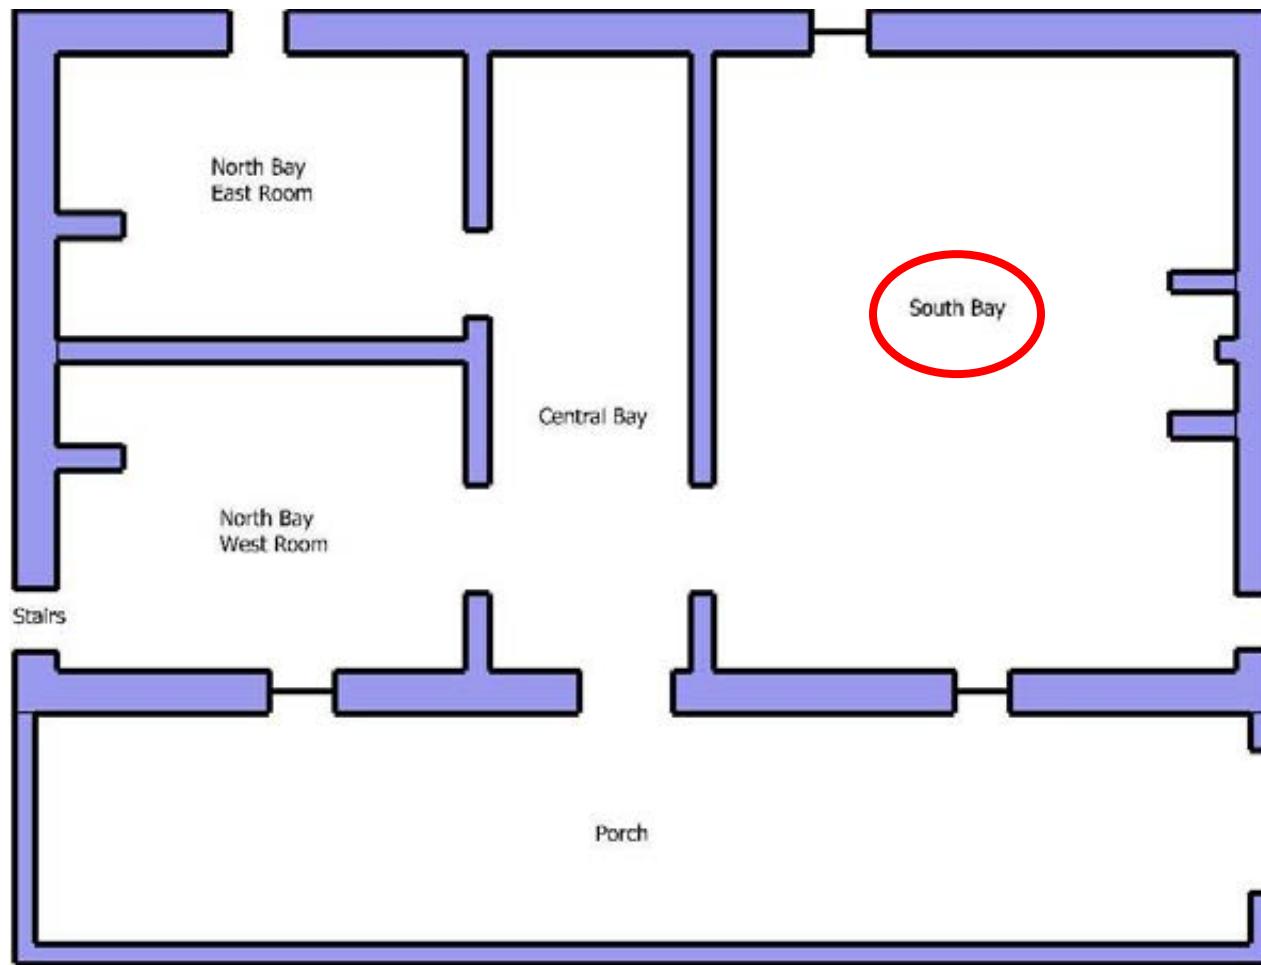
Floor plan of Bostwick's basement showing the south bay. Drawing by Kathleen Manicke.
